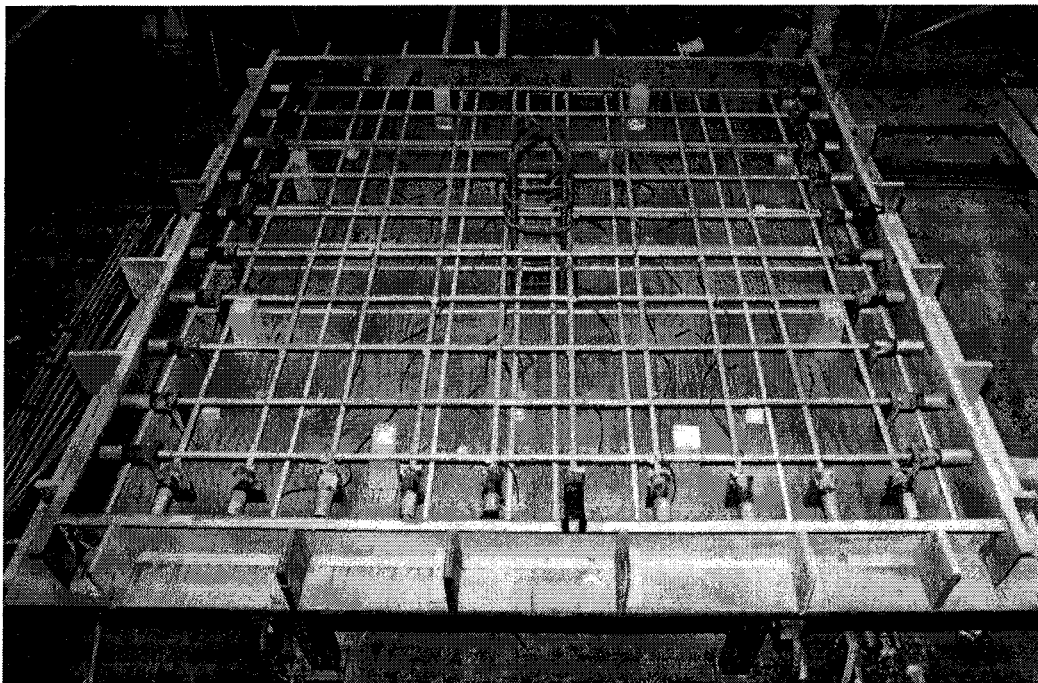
Anchor Detail : Slabs GFR-1 and GFR-2
